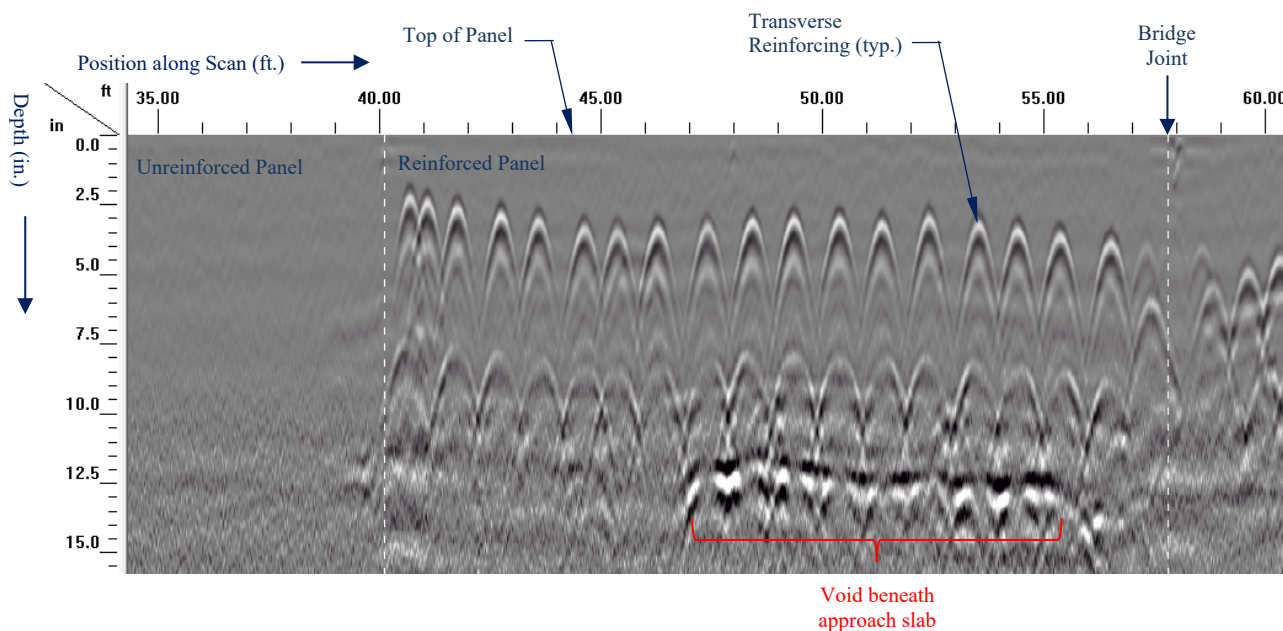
Typical processed and filtered GPR scan indicating presence of void under the approach slab adjacent to the bridge joint. Example represents portion of Scan 07 collected at Bridge 5622.50061, West approach; North shoulder.
